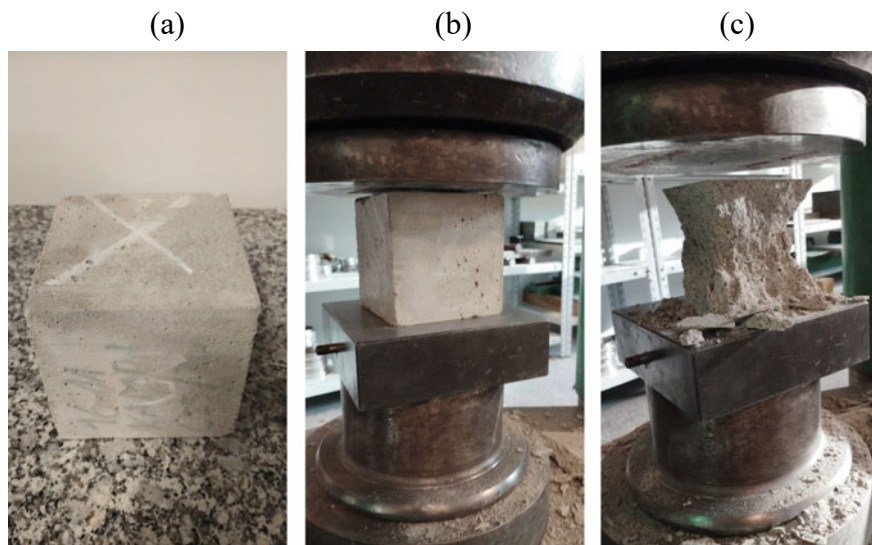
The concrete strength test: a sample prepared for testing, b sample placed in a hydraulic press, c damaged sample after testing
